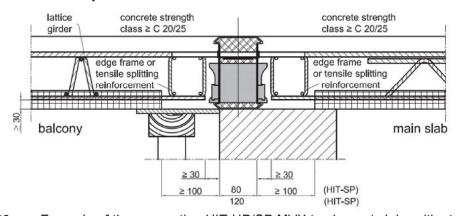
Example of the connection HIT-HP/SP MVX to element slabs with statically effective in-situ layer
